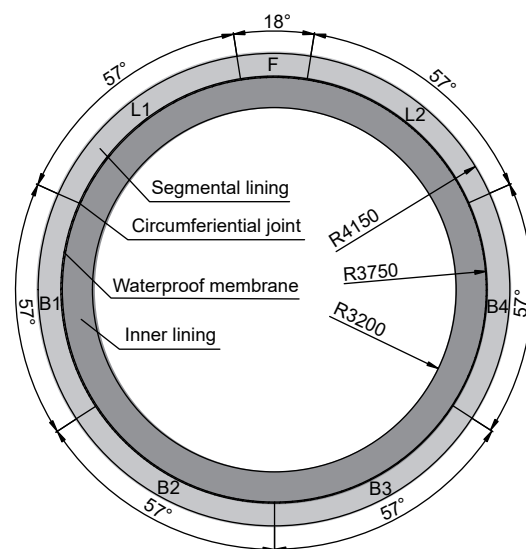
Prototype of the shield tunnel with a double-lining structure (unit: mm)
